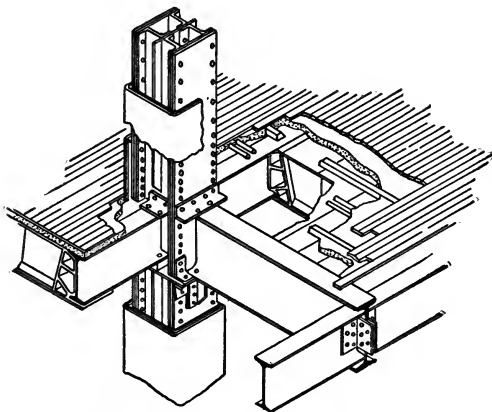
Connections of Beams, Girders, and Columns in "The Fair" Building, Chicago.
